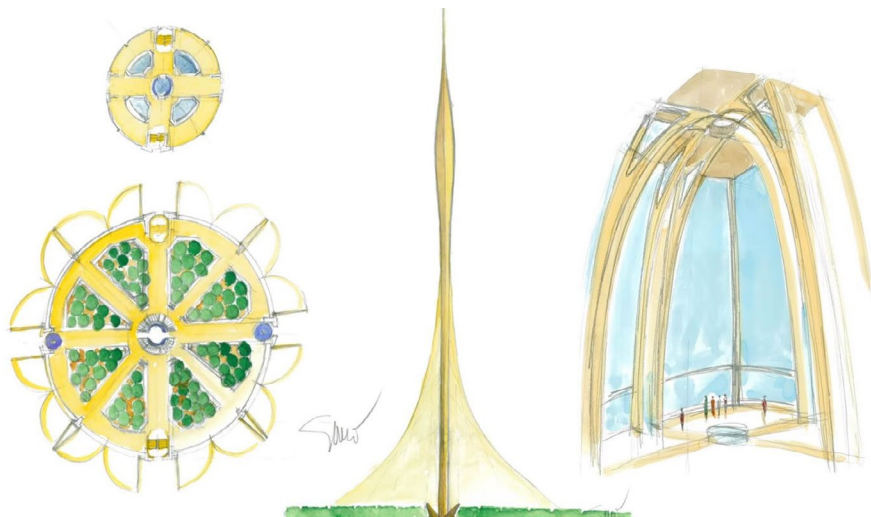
'Translated' floor plan from the initial inspiration; used as an initial floor plan design
